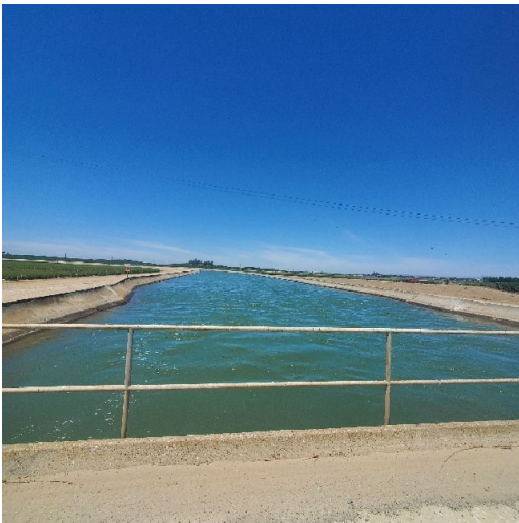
The Main Canal facing north from the bridge leading to the Dave Wilson Nursery, east of Lake Road.
